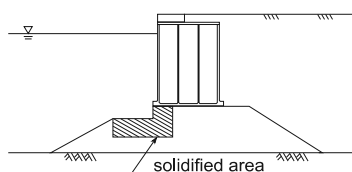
The new method to enlarge the front-water depth of the caisson-type quay wall without change in the face line of the quay wall.
